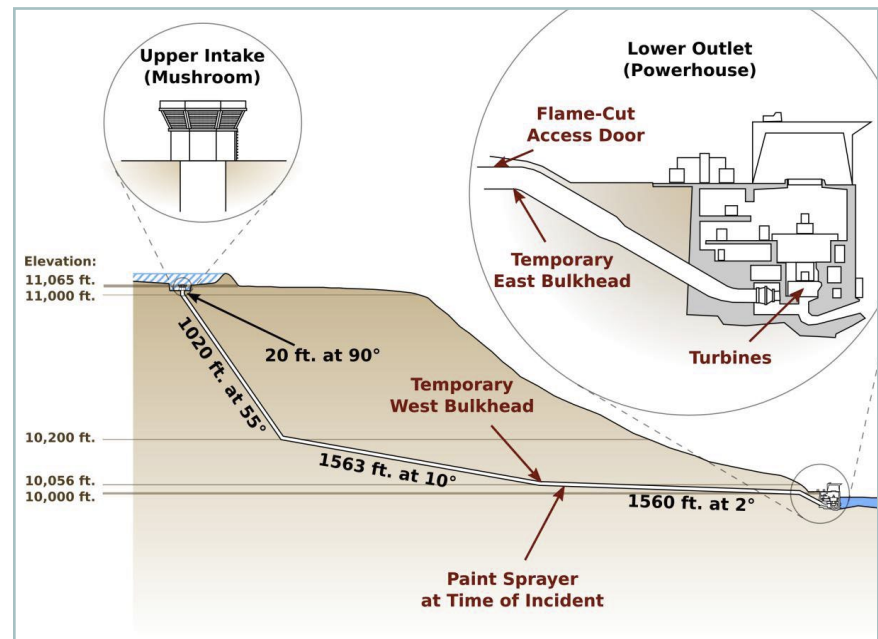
Overall penstock configuration (upper right inset shows location of flame-cut access door—the only traversable escape route in the penstock)
